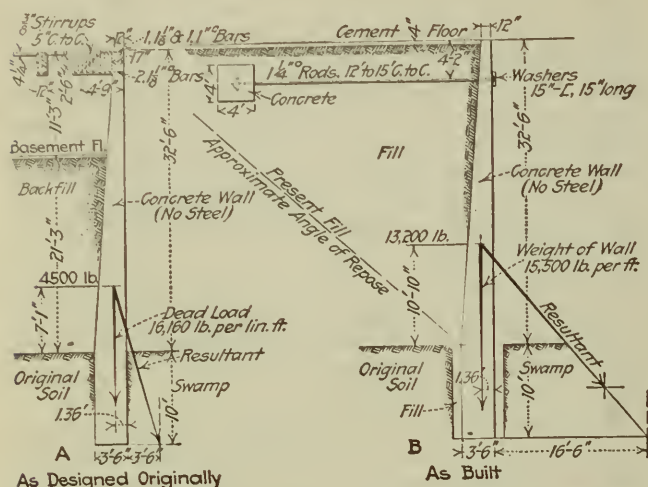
A "RETAINING WALL" BUILT IN LOS ANGELES
